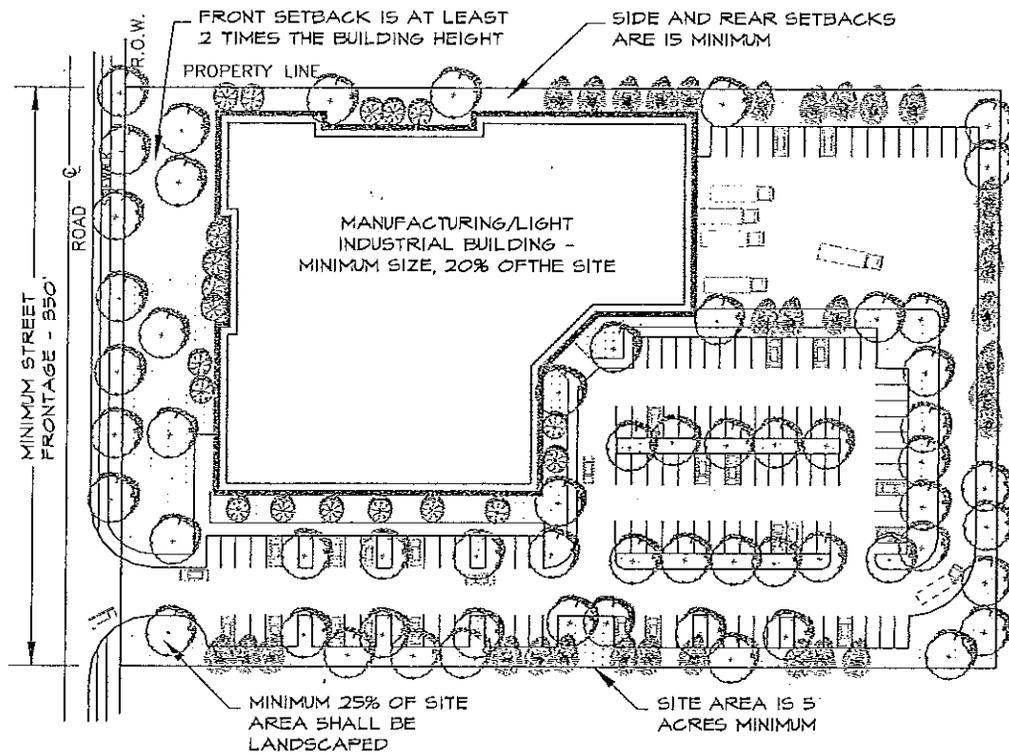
TYPICAL SITE LAYOUT MANUFACTURING / LIGHT INDUSTRIAL LAND USE AREA
